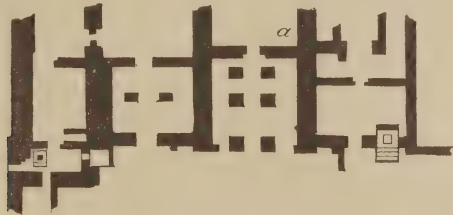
PORTION OF GROUND-PLAN OF BUILDING UNCOVERED BY CHARNAY.
